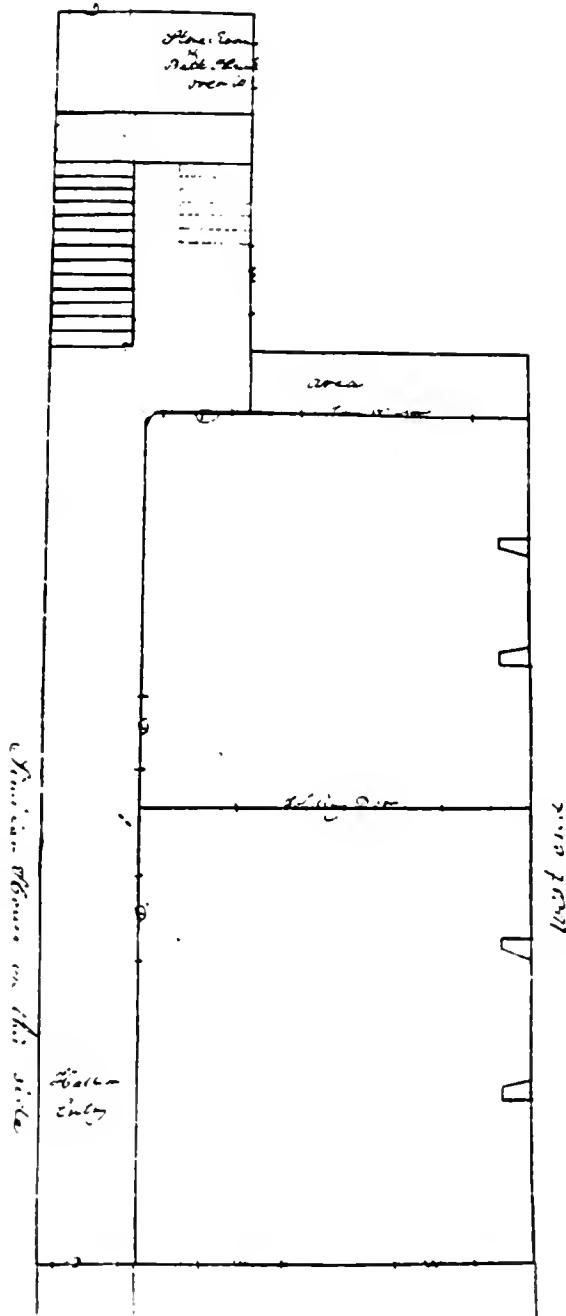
Plan of first floor of the westernmost house on Colonnade Row. Colonnade Row was built following a pattern more common in New York townhouses of the period; instead of having a long backbuilding with the kitchen and pantries on the first floor and dining room above, Colonnade Row had the dining room in the cellar facing the street well, the kitchen and pantry were behind the dining room. Plan from: Franklin Fire Insurance Company of Philadelphia, Perpetual Policy #115, written July 26, 1830. Franklin Fire Insurance Company Papers, H.S.P.
